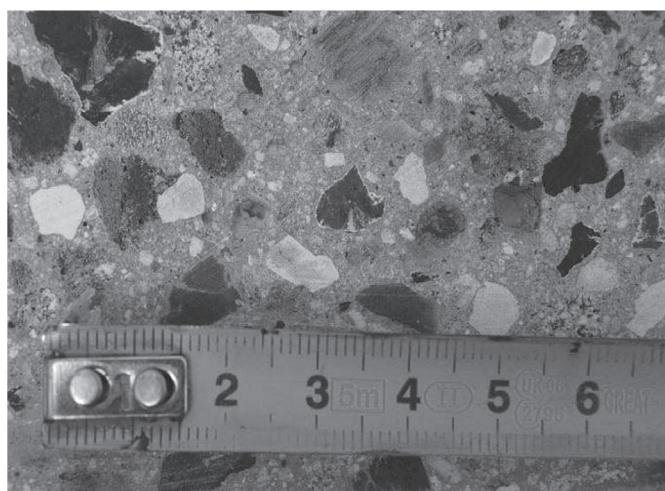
Saw cut of concrete with burnt coal tailings tested
